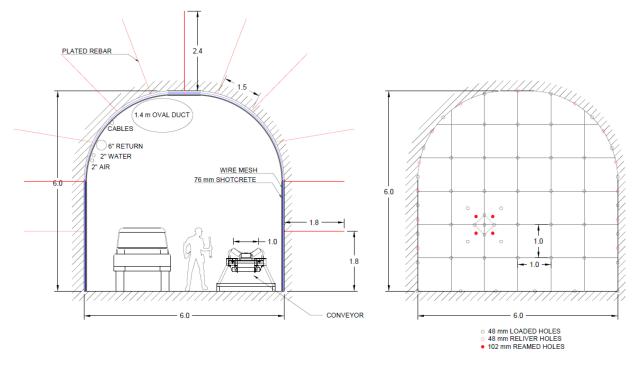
Development Cross Section for Typical 5.5 m x 5.5 m heading
